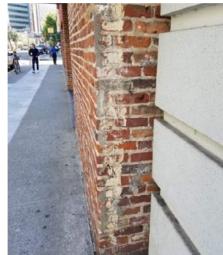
447 Battery Street, corner of primary façade and north façade which abuts the adjacent building. Patched concrete and former painted sign visible.
